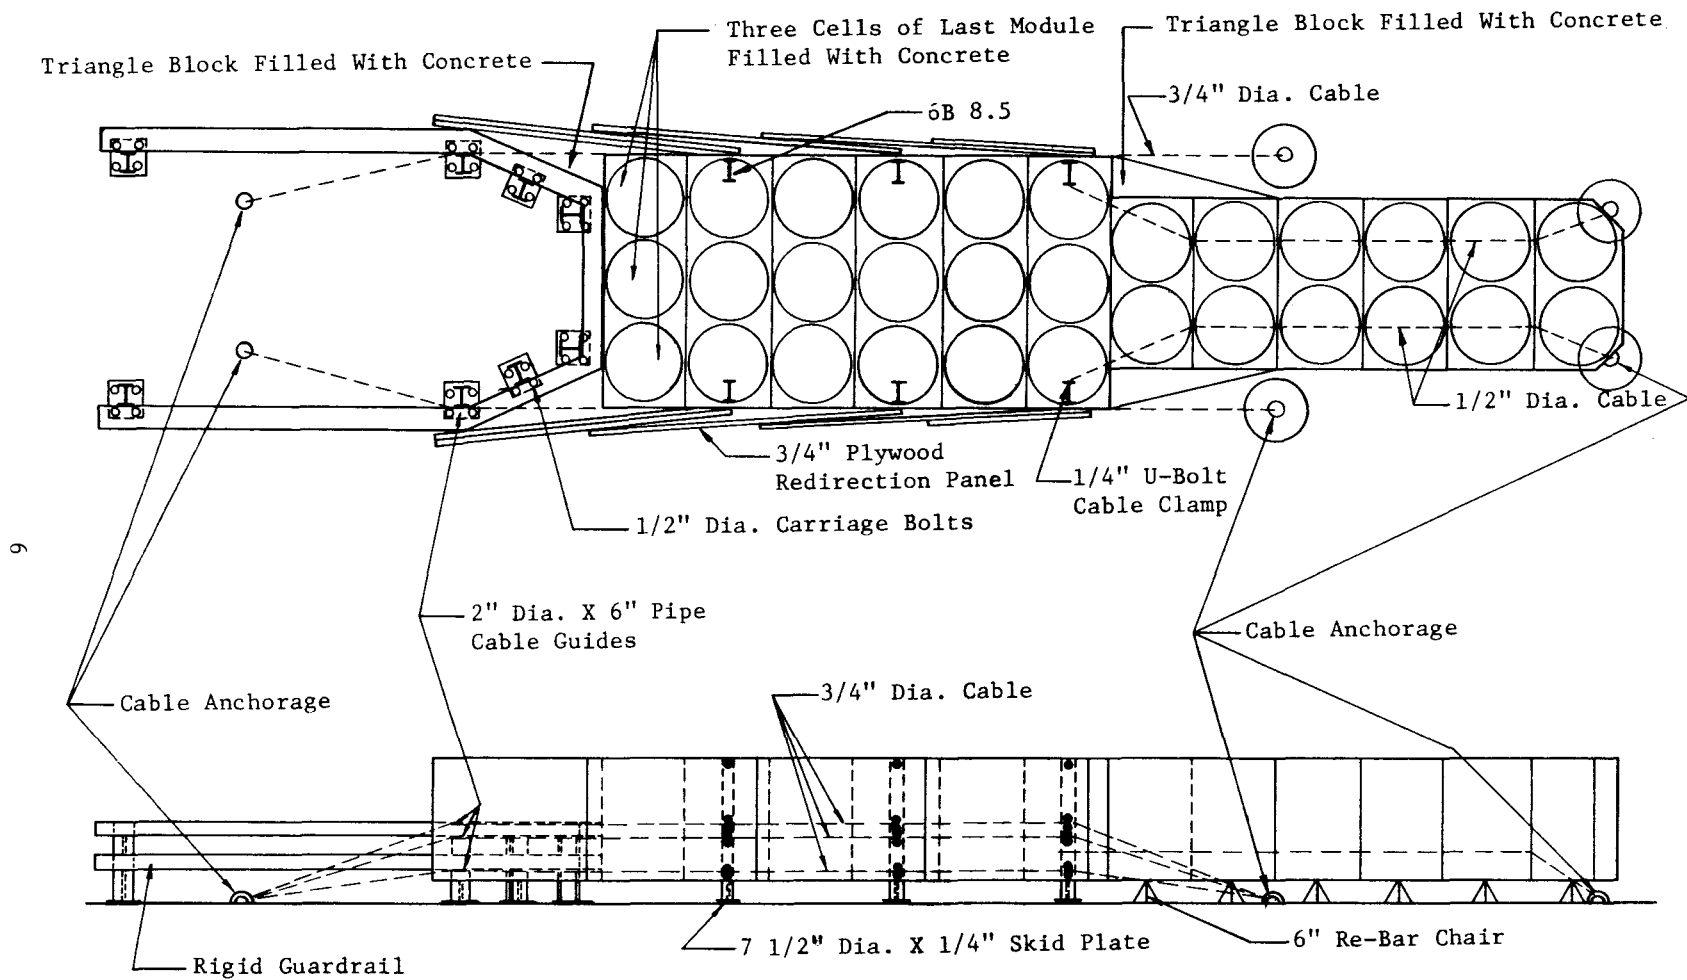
, Details of Concrete Crash Cushion (Tests FLA-1 & FLA-2) (Mod II).
